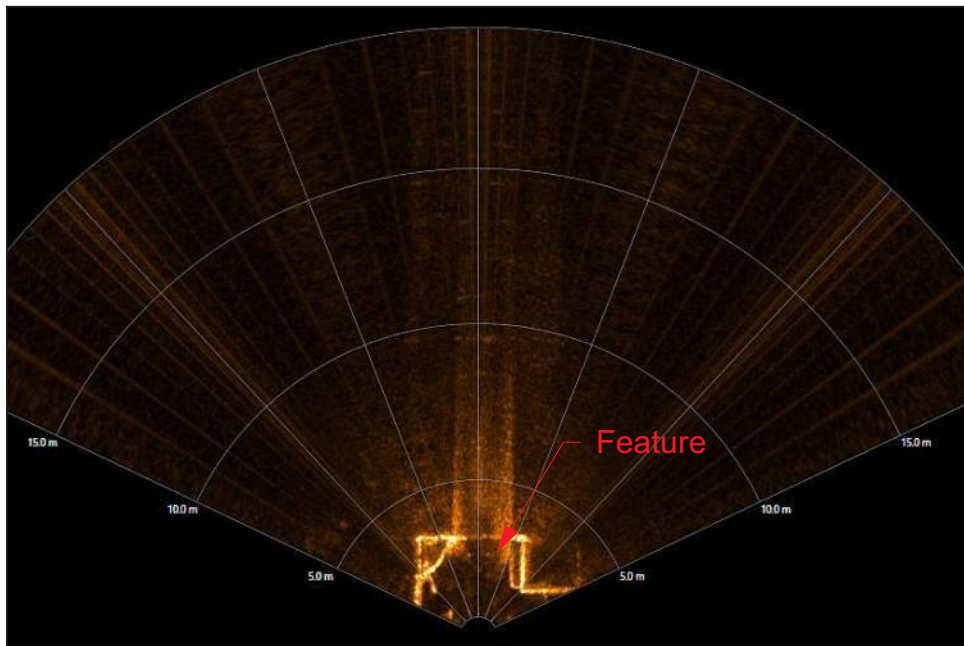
Sonar image within manhole chamber at 156 feet downstream of Access Point 1.
